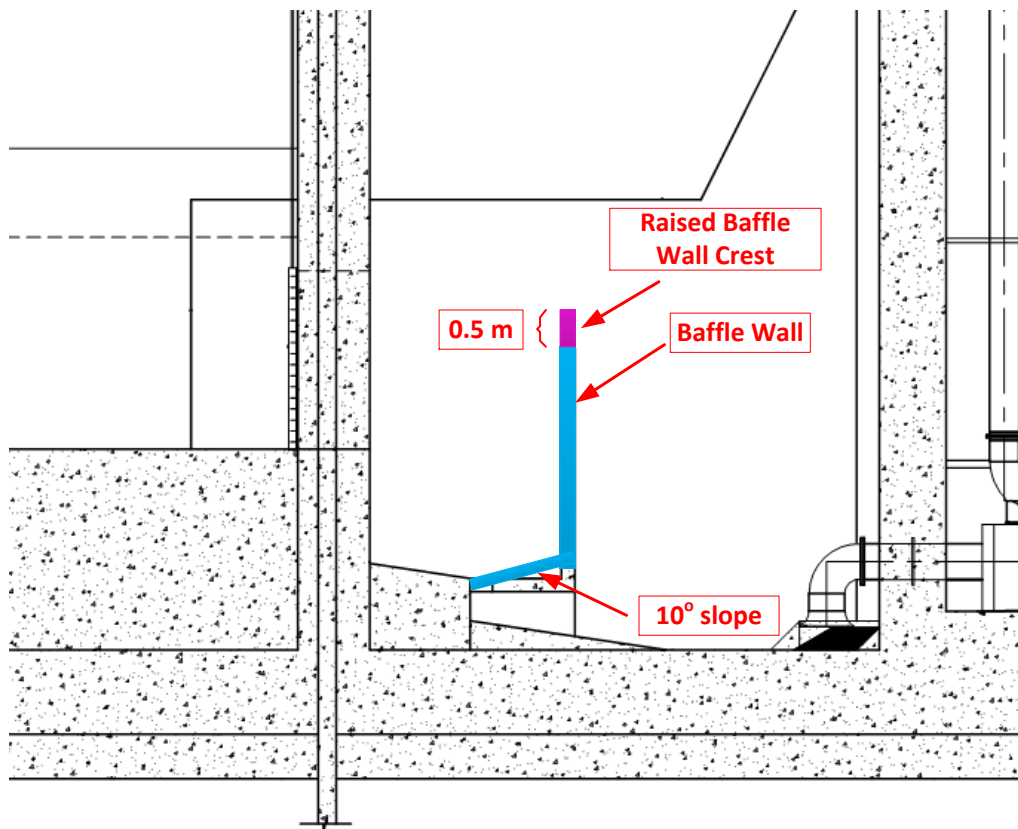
Increase in Baffle Wall Height and Addition of Sloping Baffle Floor
